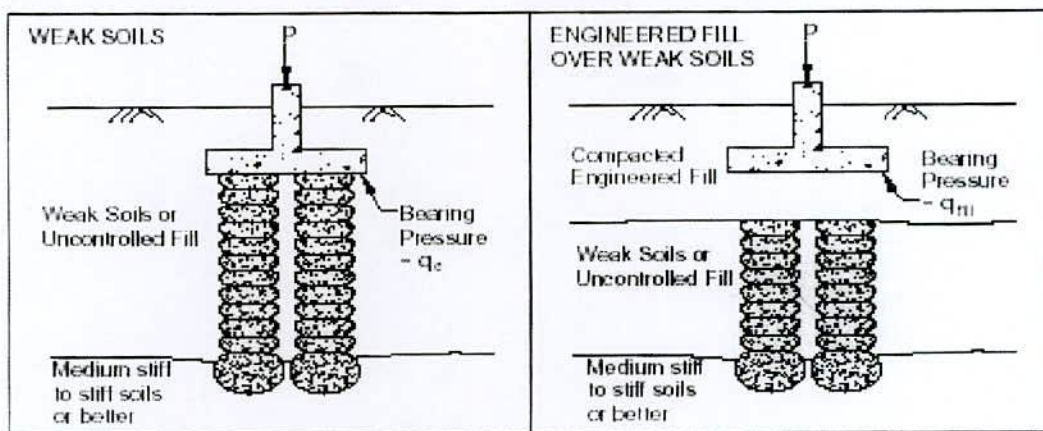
Design of RAP foundation (Farrell et al., 2004)
